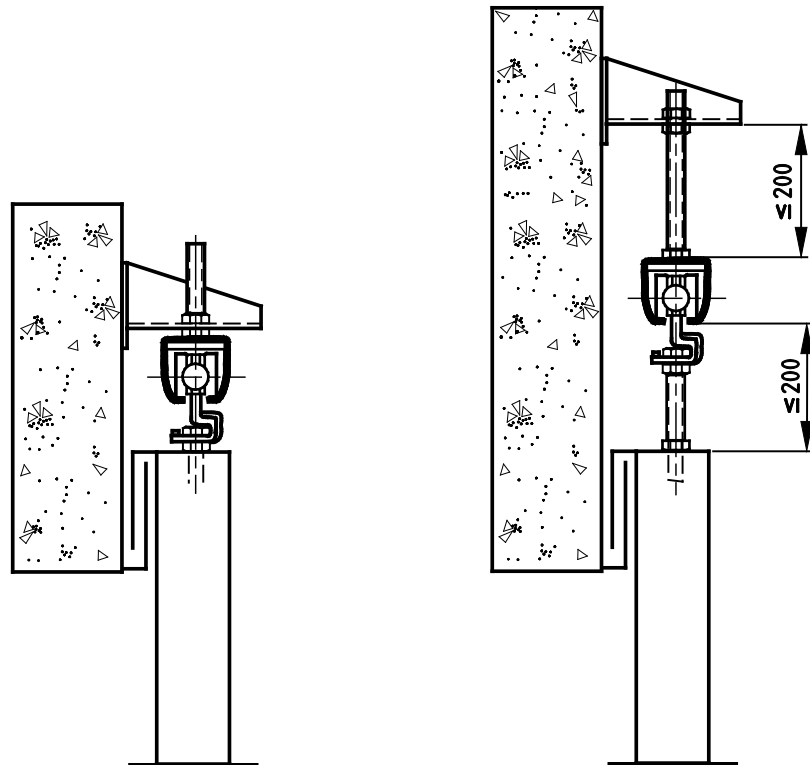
Distance between top of door leaf and bottom of guide and distance between top of guide and bottom of wall / ceiling mounted elements
